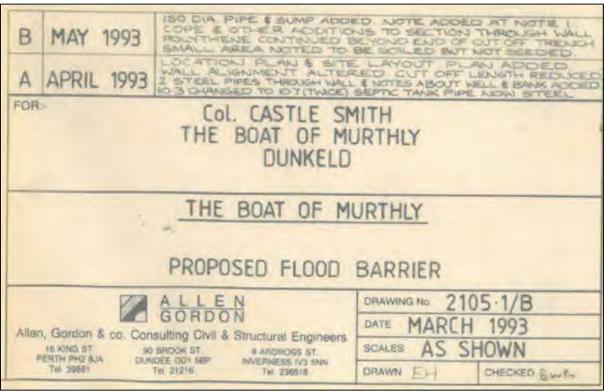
Excerpt from original design drawing of flood wall by Allen Gordon Consulting Engineers (1 of 5)
